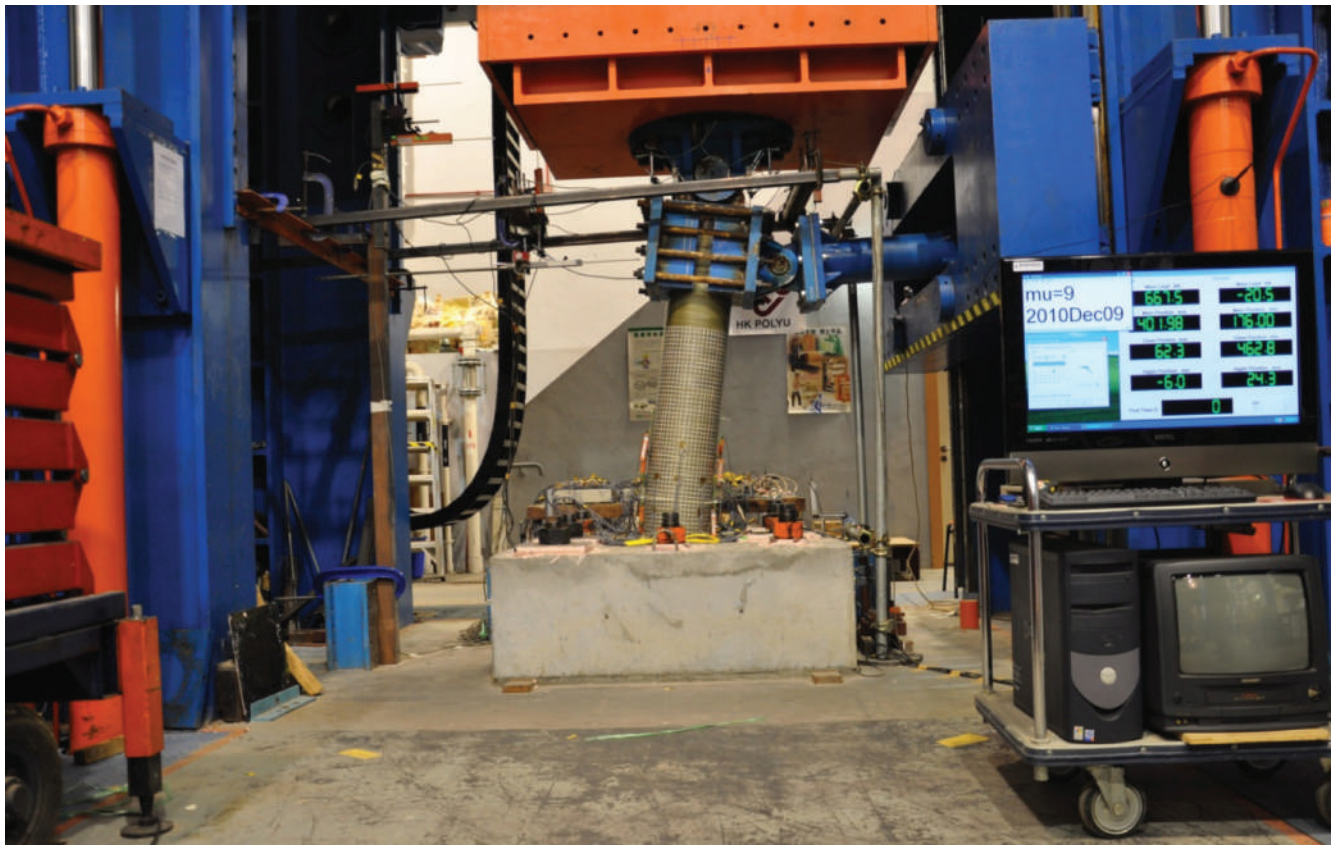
Full-scale cyclic lateral loading test of a hybrid DSTM.
